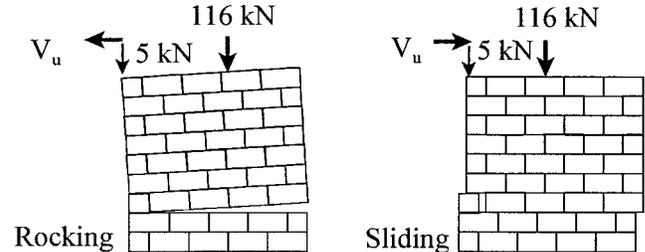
Cracking and Sliding Pattern Observed in Wall 9
